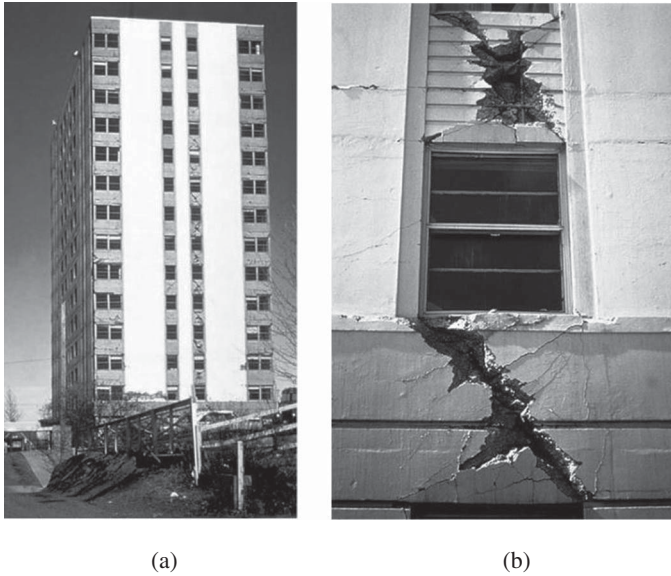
14-storey 1200 L Street apartment building, Anchorage, Alaska, after damage from the 1964 earthquake (a) Overall view of damage (b) Close-up of characteristic X-shaped cracks and failure of coupling beams
